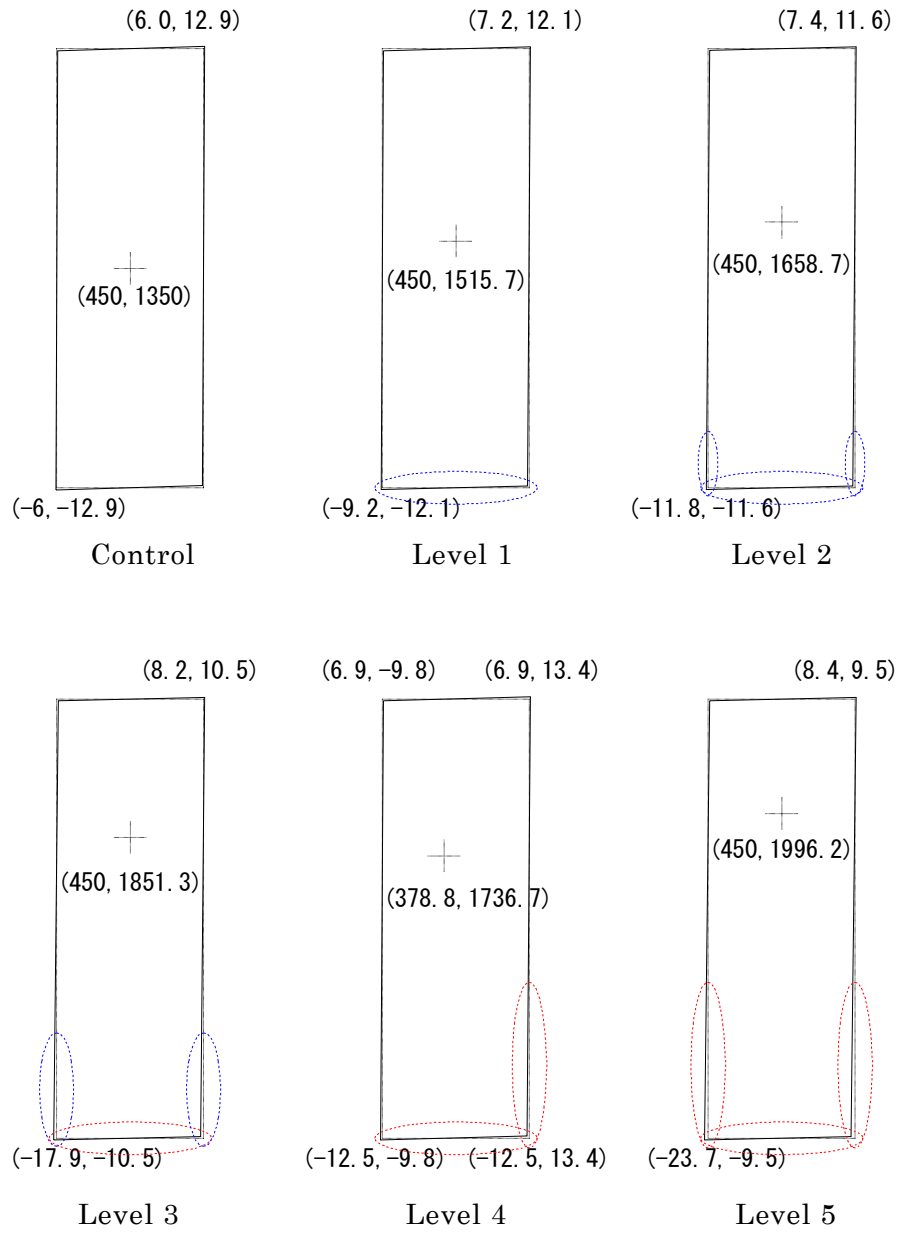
Center position of rotation and slip of corner nails at 1/30rad.
